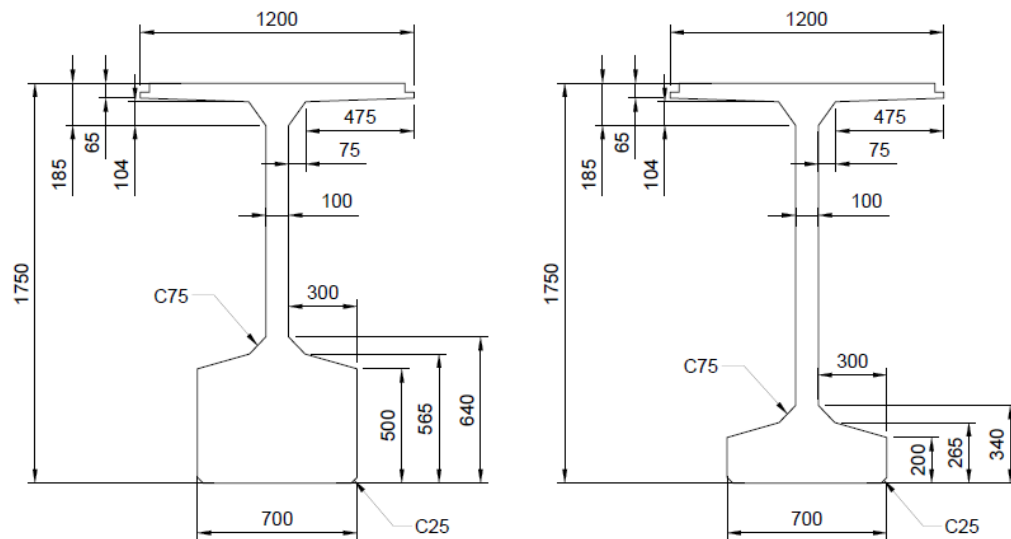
36 Girder section of 40m span UHPFRC post tensioned I girder at support and mid span
